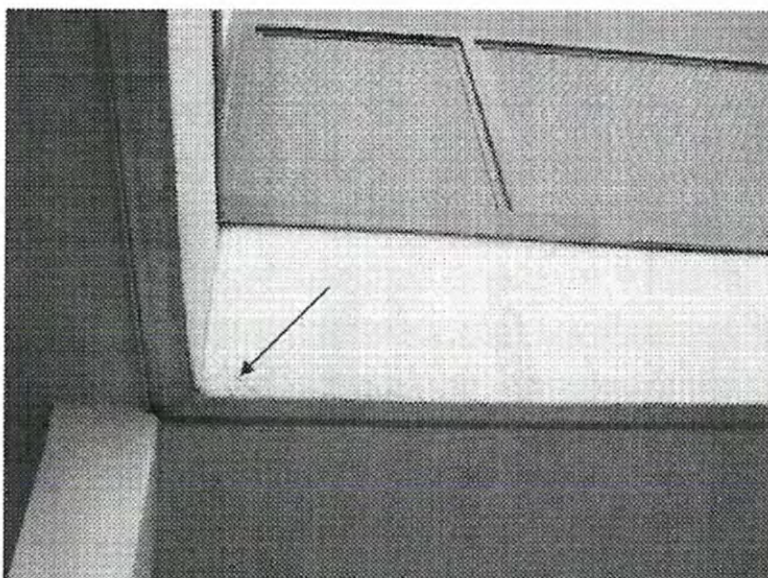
One uncontrolled crack and staining visible at breezeway on Building C.
